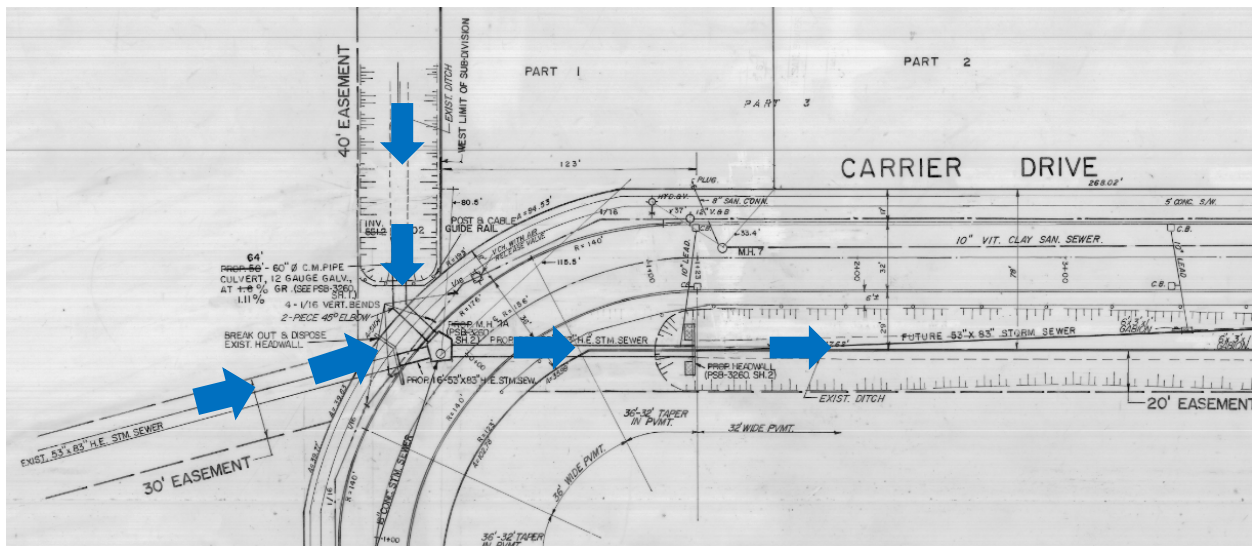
Carrier Drive Culvert/Sewer Alignment
